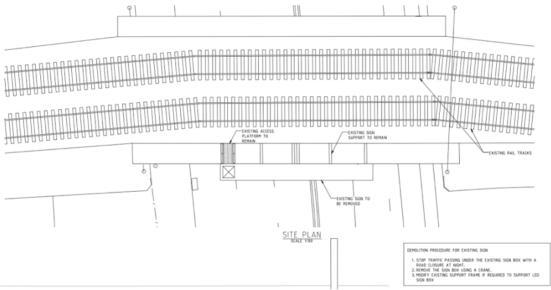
Existing site plan and proposed demolition procedure (Source: Dennis Bunt Engineers)
